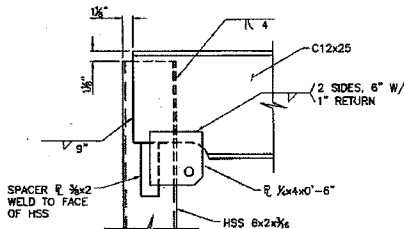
EAST SIDE EAST HATCH & WEST SIDE WEST HATCH
